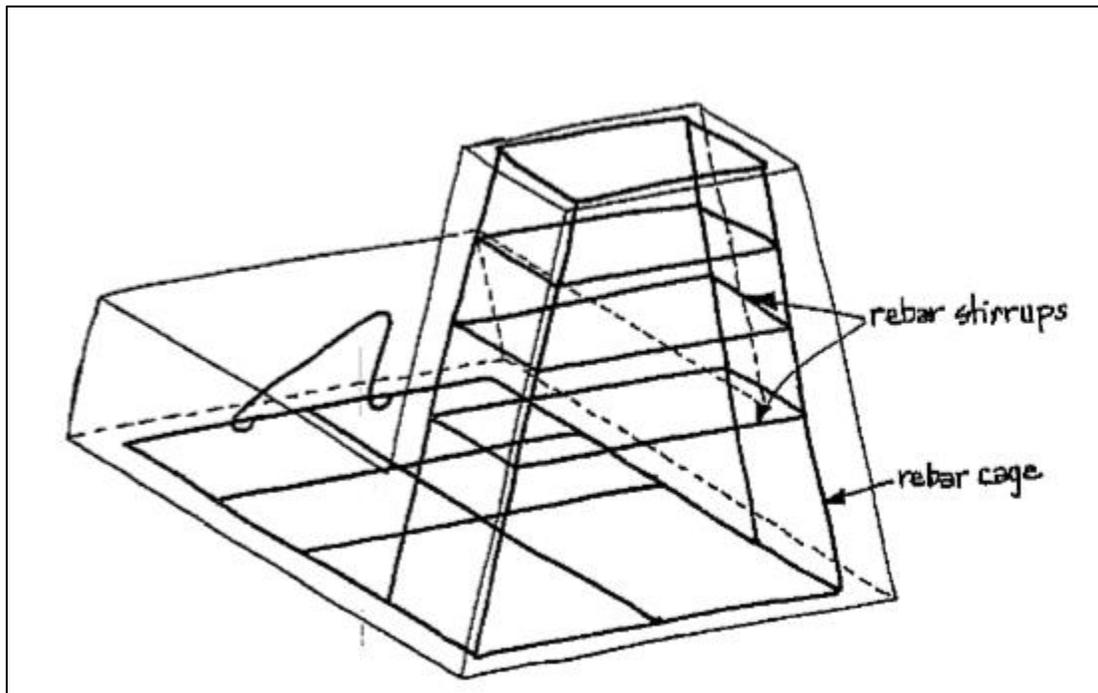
Sketch of the Placement of the Reinforcing Steel in the Bridge Anchor [11]
